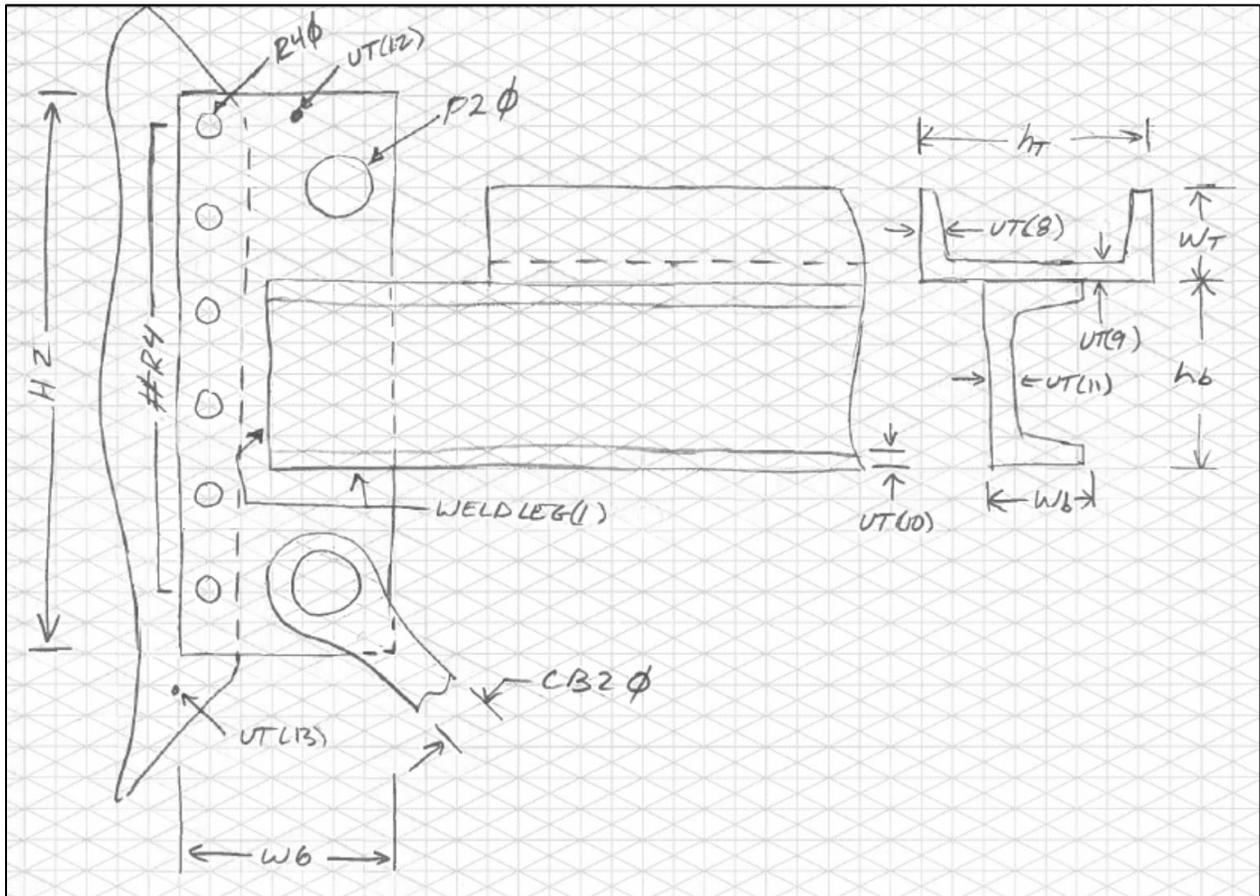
Example sketch of wind strut dimensions – new sketch to be produced if missing dimensions/structural elements are observed at site. Dimensions and UT locations identified.
